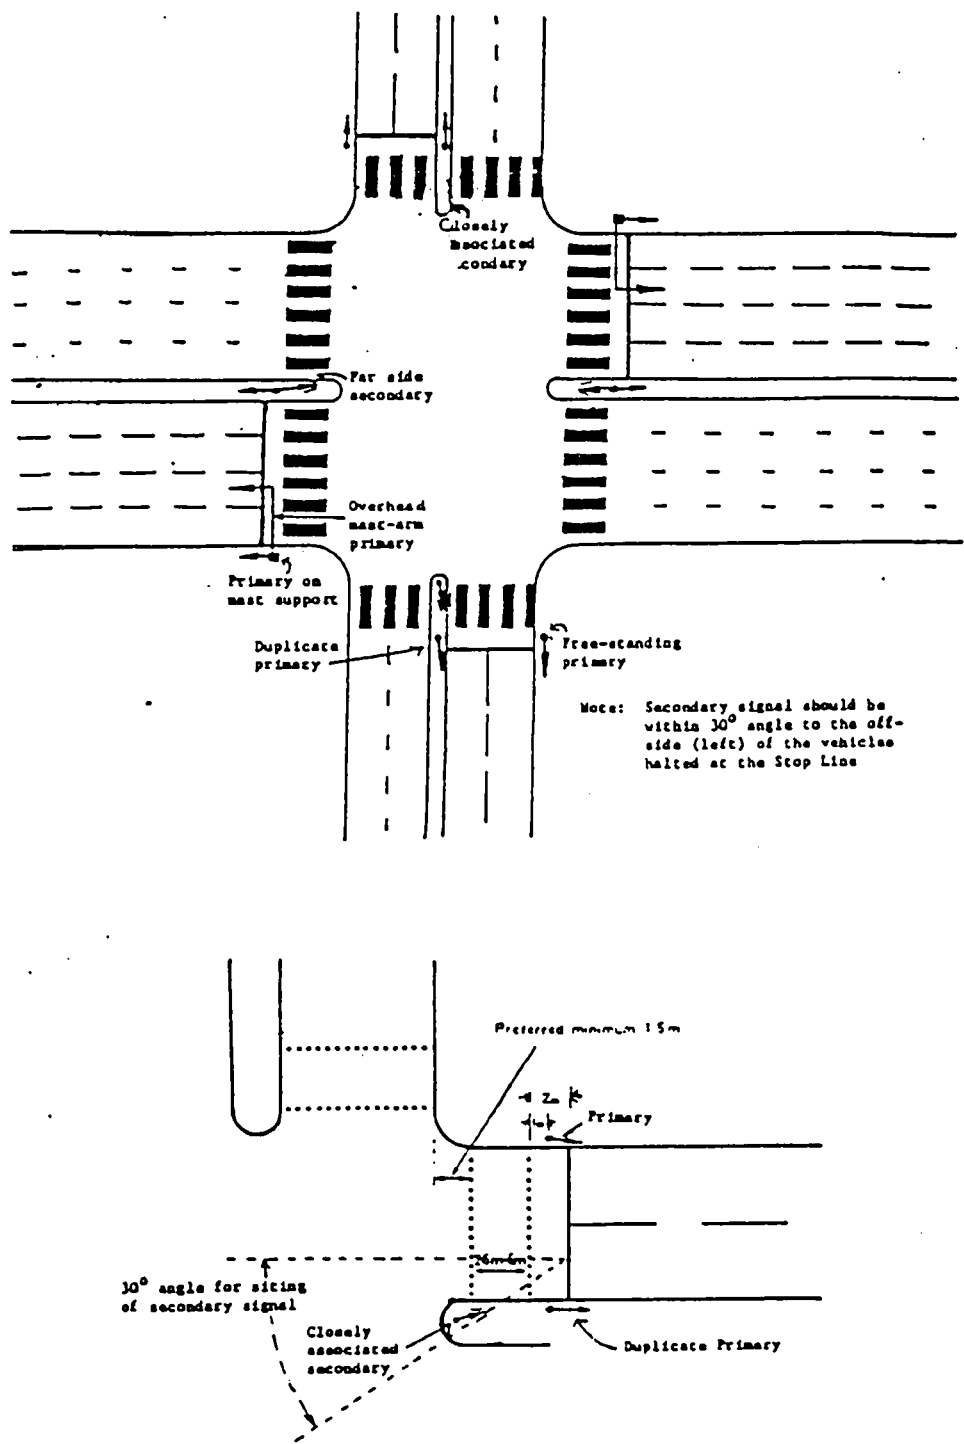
Typical signal pole positions (Saudi Arabia).
